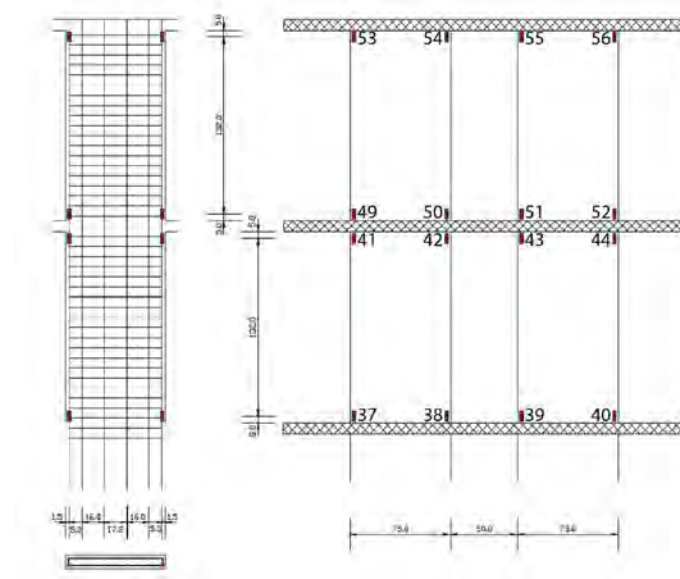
Strain gauges – 2nd and 3rd floor walls (on longitudinal bars)
